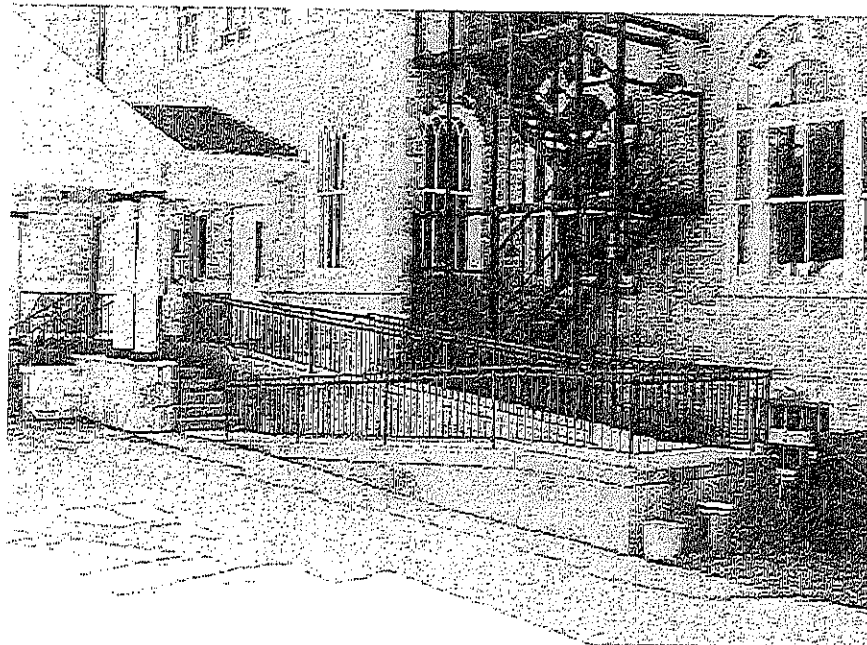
The metal fire escape on the east elevation has caused substantial rust staining on the masonry walls.
